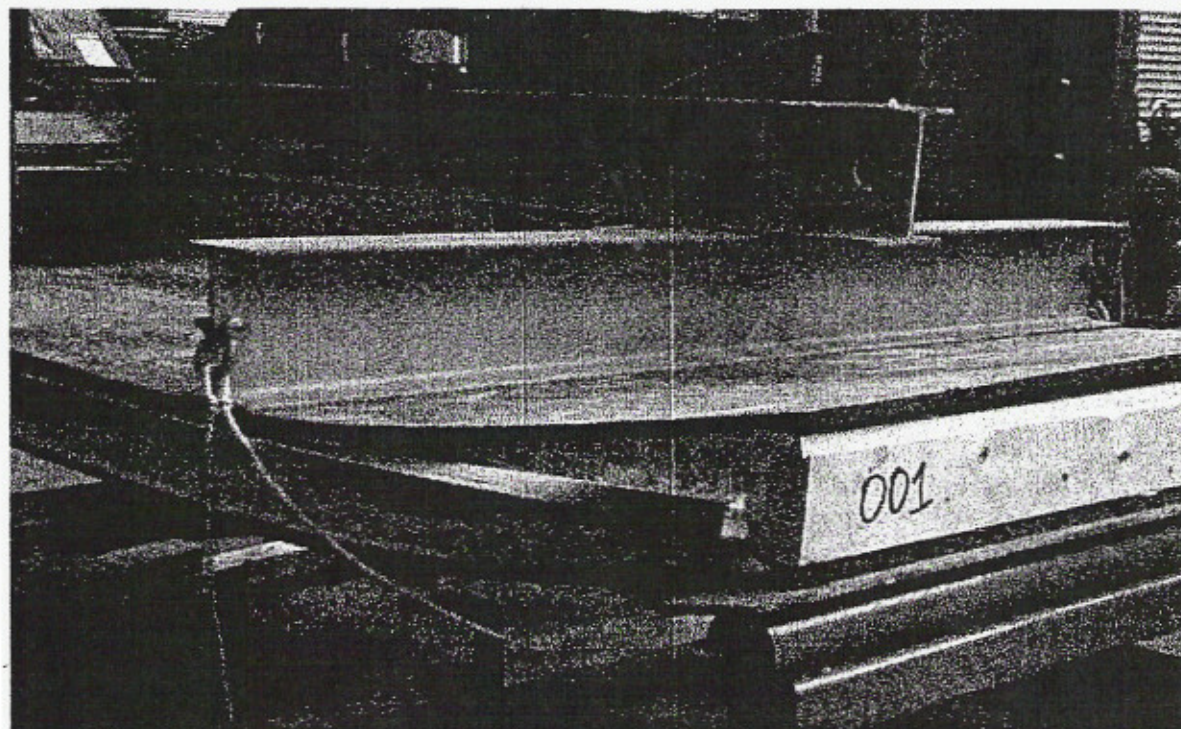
Closeup of Failure of 8' OSB-OSB Panel Under Transverse Loading
